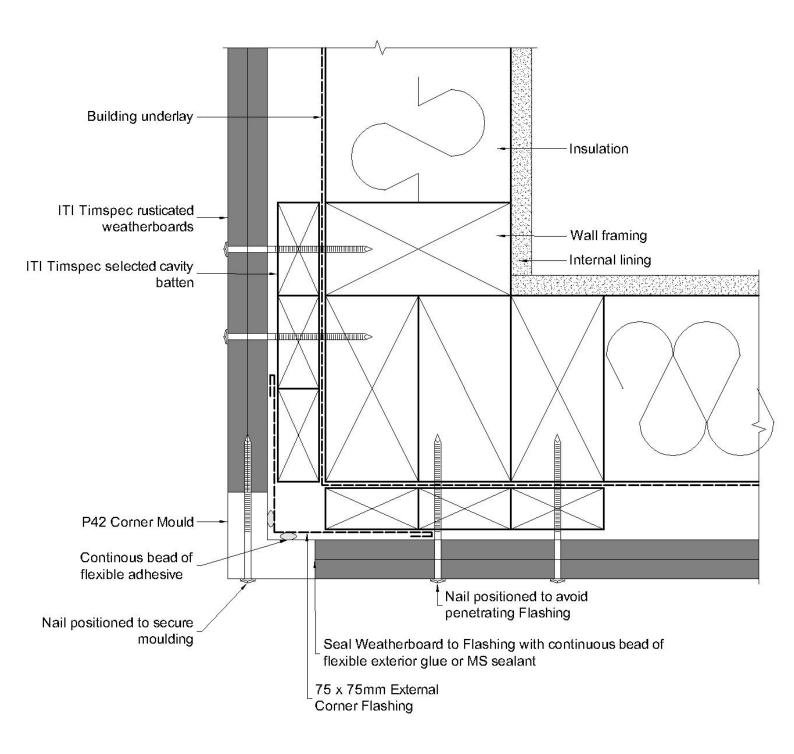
11 RC 403 EXTERNAL CORNER - BOXED
